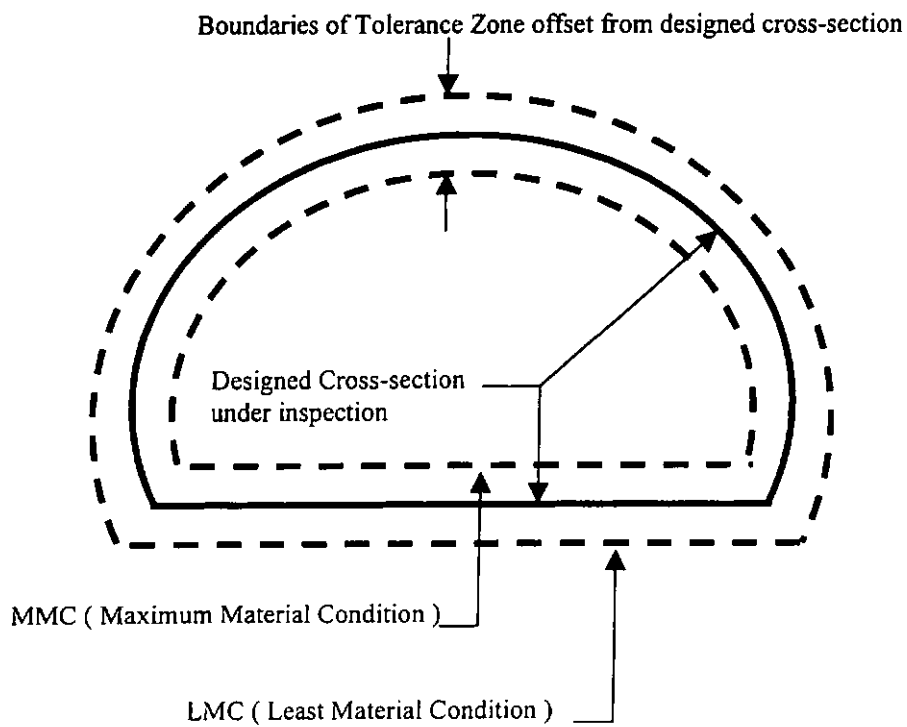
Tolerance zone of a tunnel cross-section under inspection.
